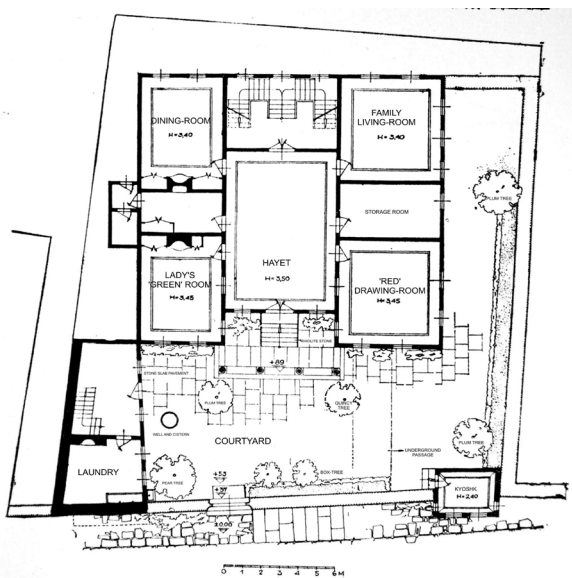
Ground floor plan of Nedkovich house [2, 219].
